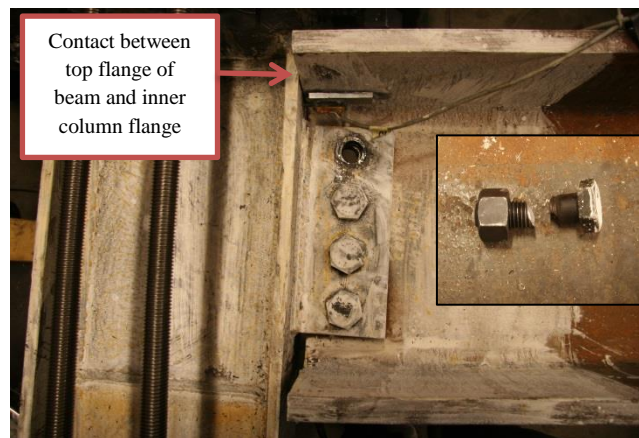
S shear tab bolt fracture at +3.0% drift (FB).
